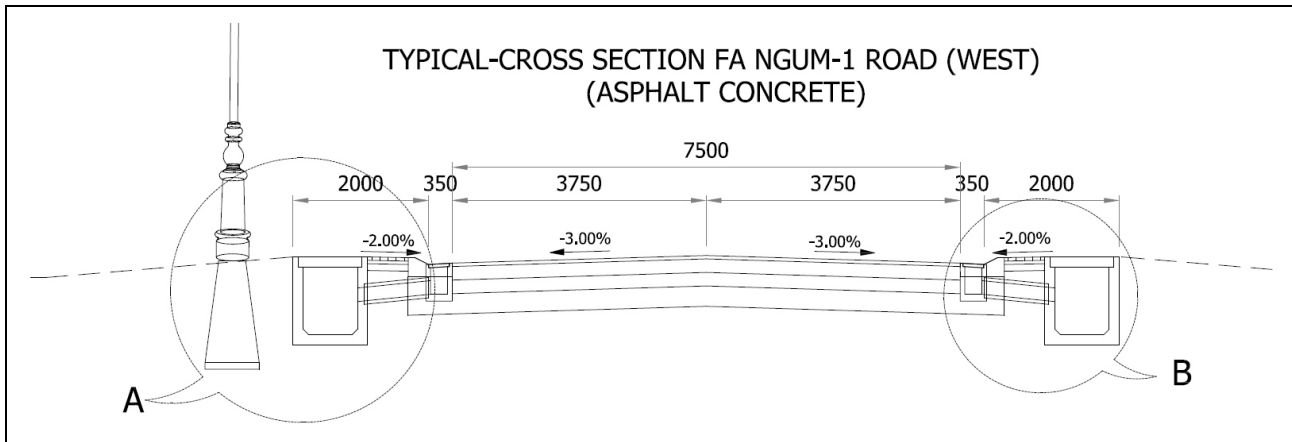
Typical cross-section of Fa Ngum-1 Road (West)
